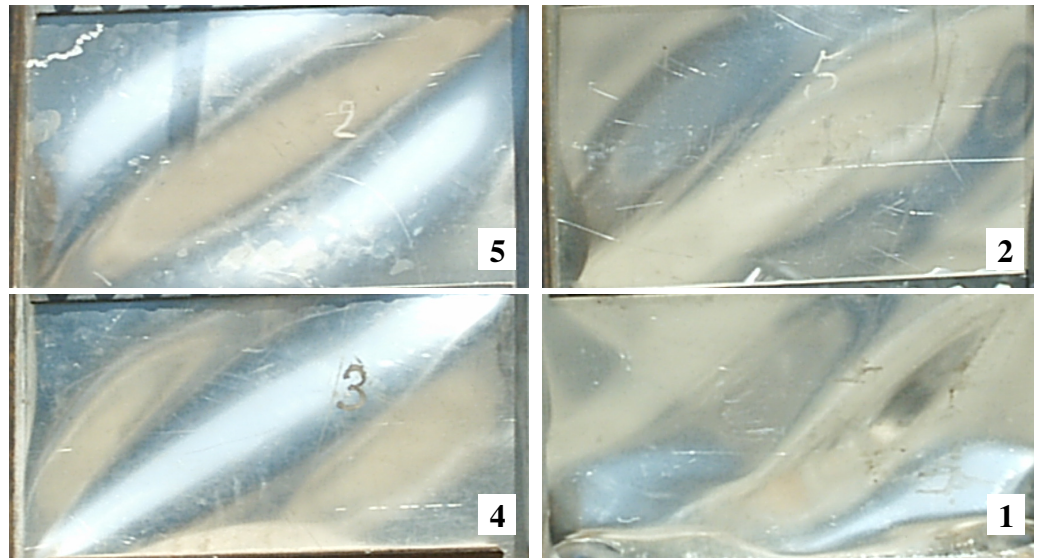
Deformed shapes of sub-panels (with their own number) belonging to the shear wall located at the back side of the RC structure
